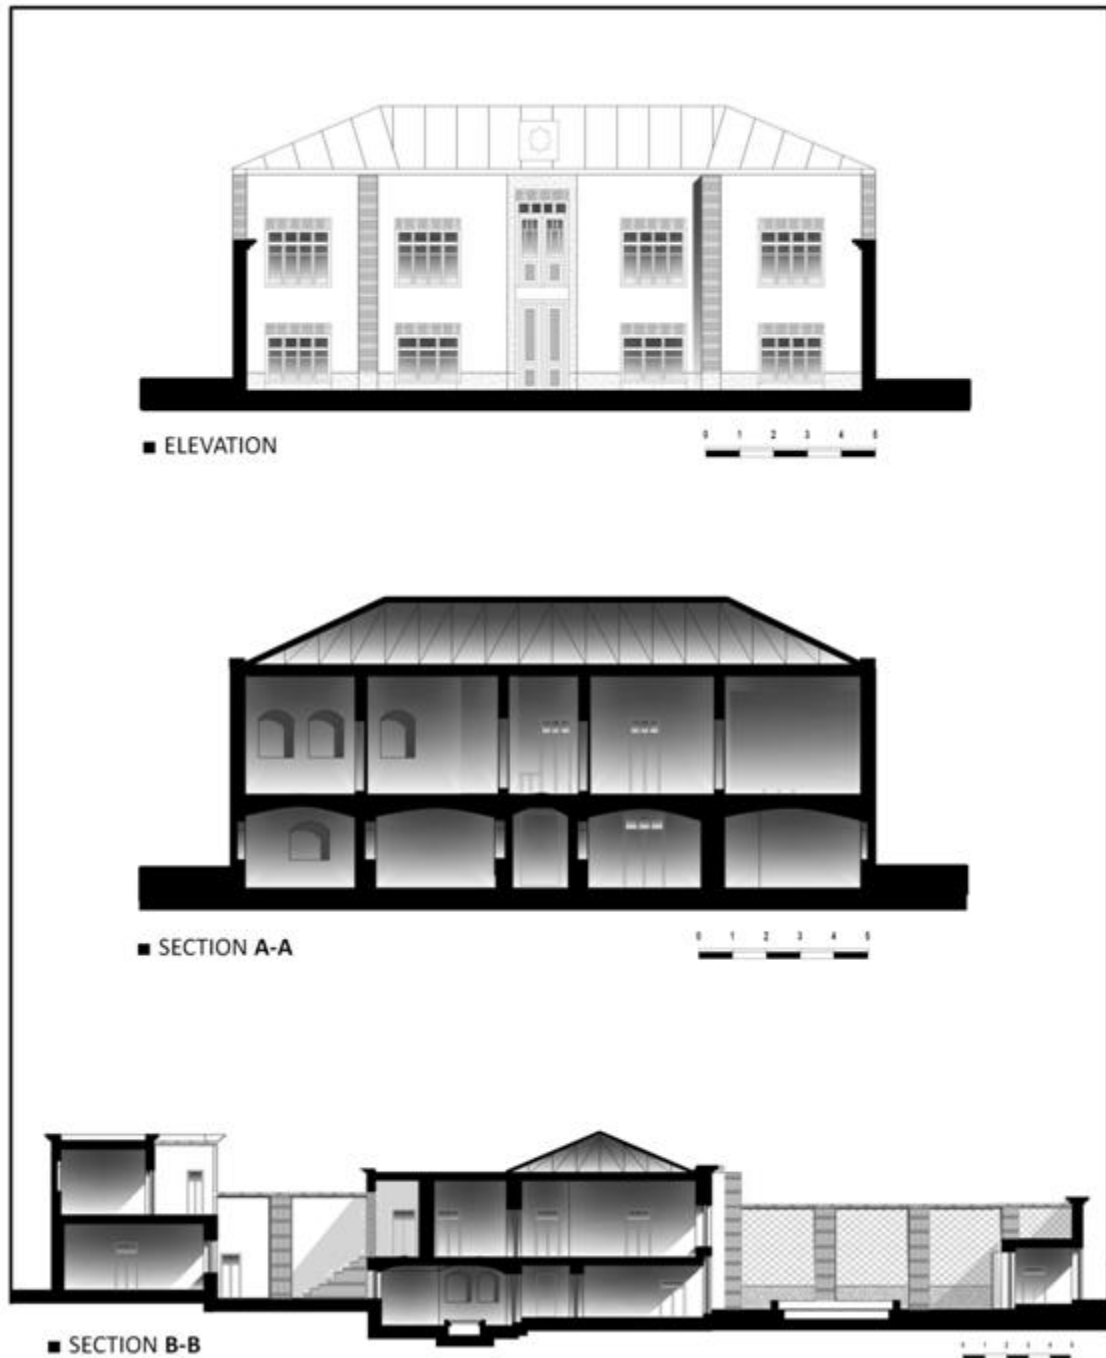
elevation and sections of the Eslami house, source:(Estaji, 2010, Towhidi-Manesh, 2001b) and the local archives of ICHTO, with corrections
